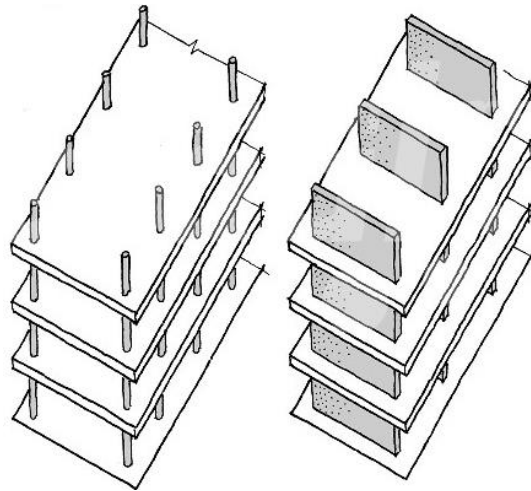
Column structure (left) and wall structure (right) (Oosterhoff, 2013)
